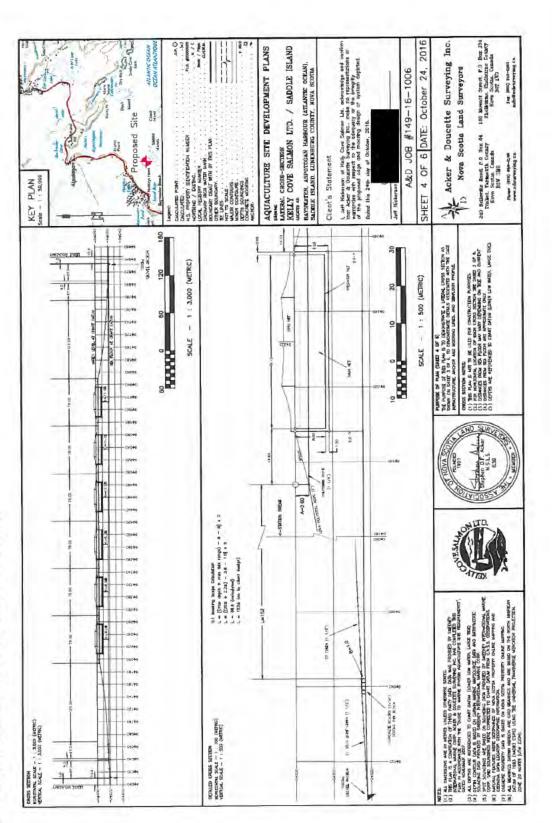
Saddle Island Site Development Plan Showing Cage Configuration
